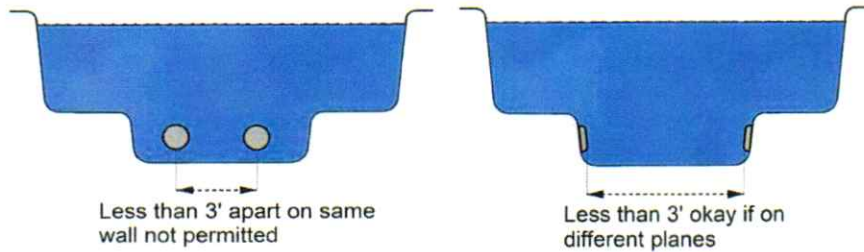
Blockable SOFA's closer than 3' on the same wall not permitted.
